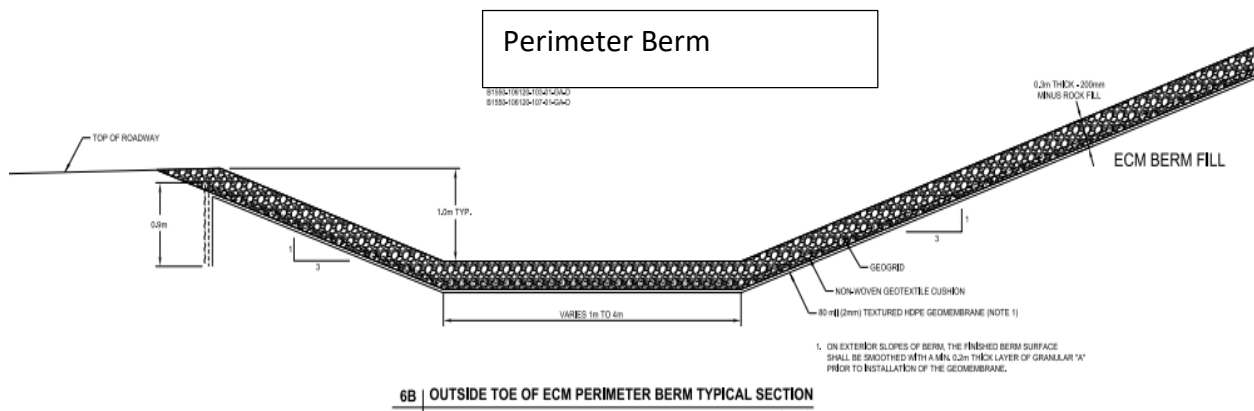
Outside Toe of Perimeter Berm (Typical Section)
